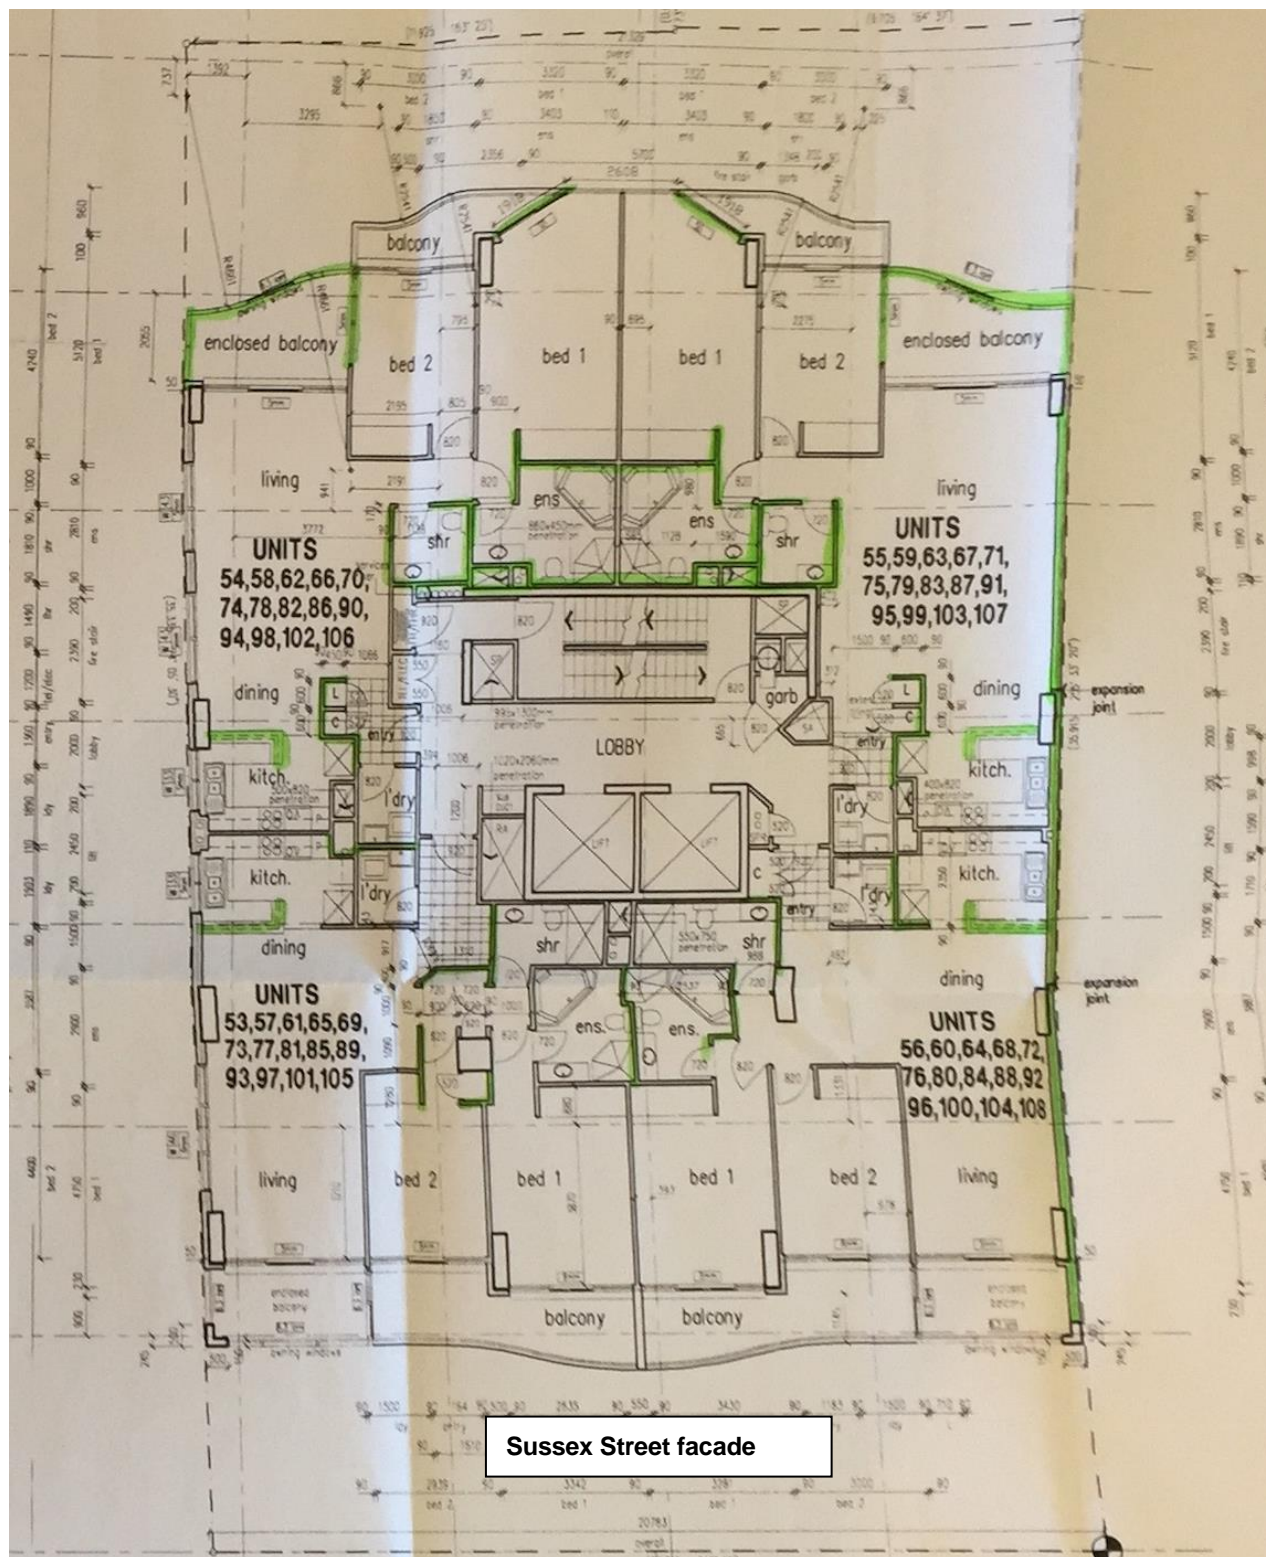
Level 16 – Level 29 Floor Plan (Astoria)
